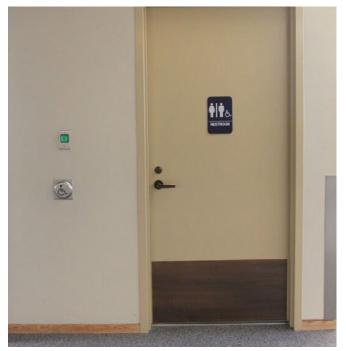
Exterior view of washroom Photo by: Ron Wickman
